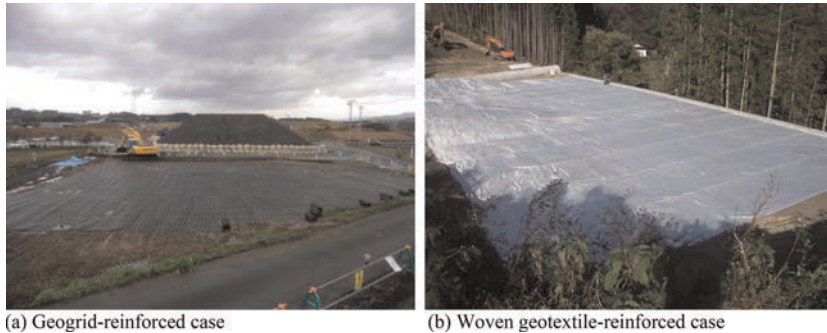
Geosynthetic reinforcement embankment applications in Japan.
